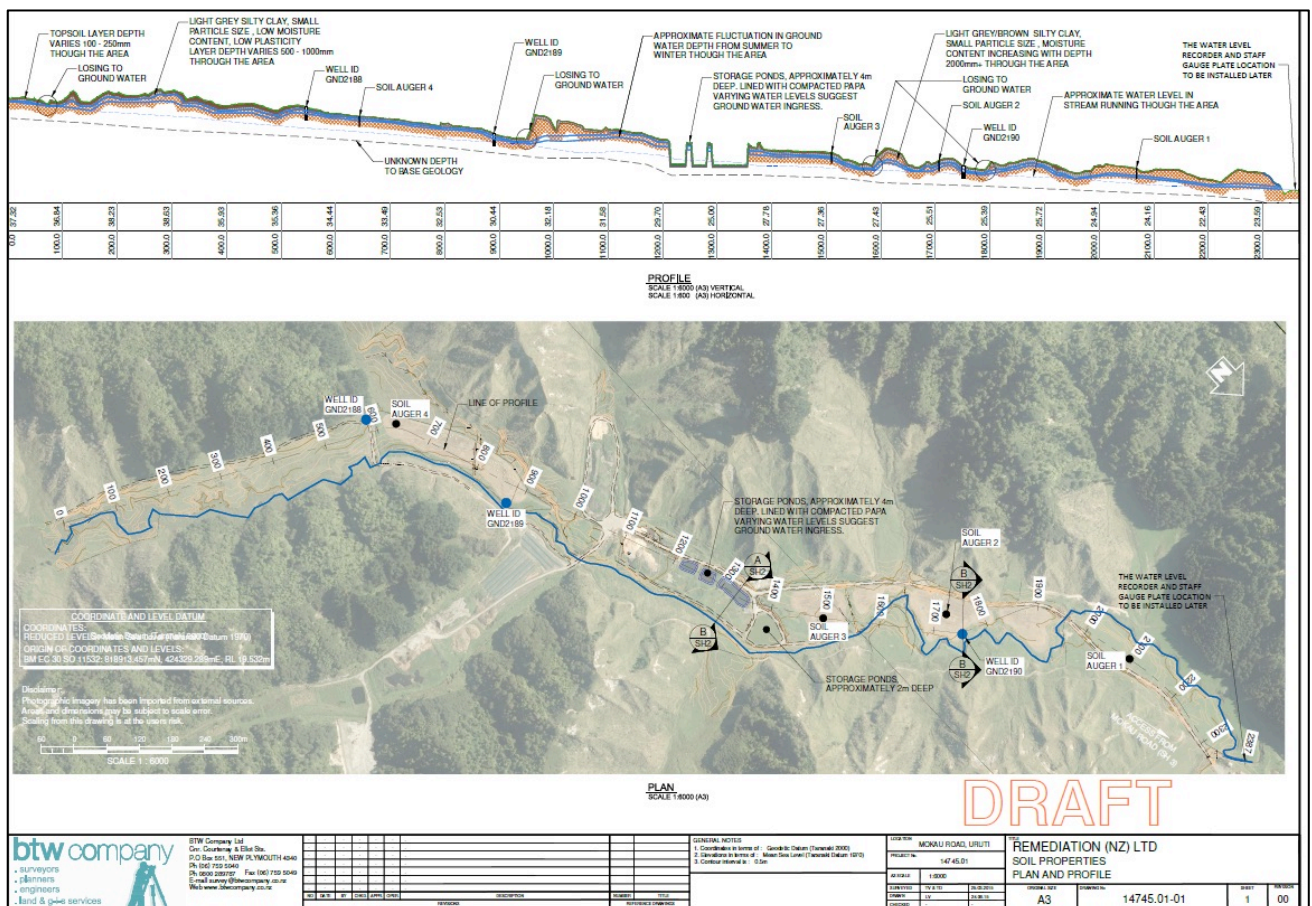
Uruti Site Ground Water Model (Source: Uruti Composting Facility Management Plan BTW section 2.3 see Appendix H)
